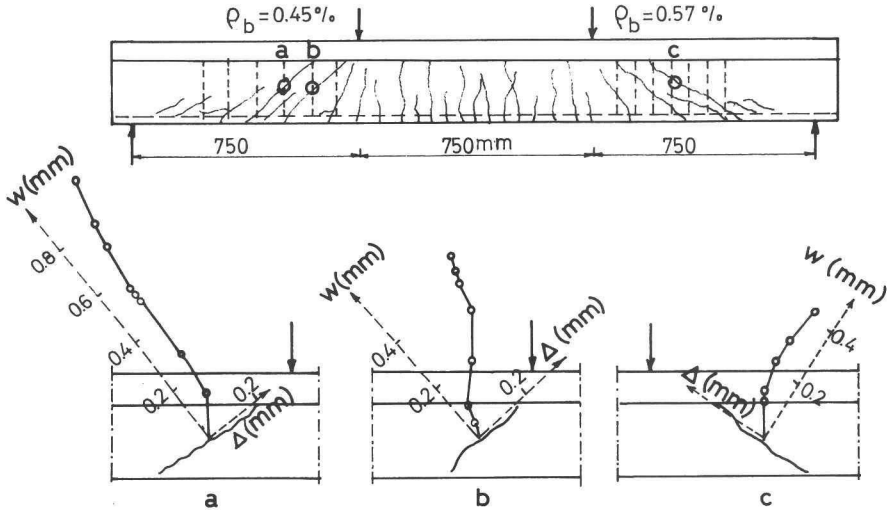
Measurements on cracks in a partially prestressed beam without shear reinforcement [ 8 ]
